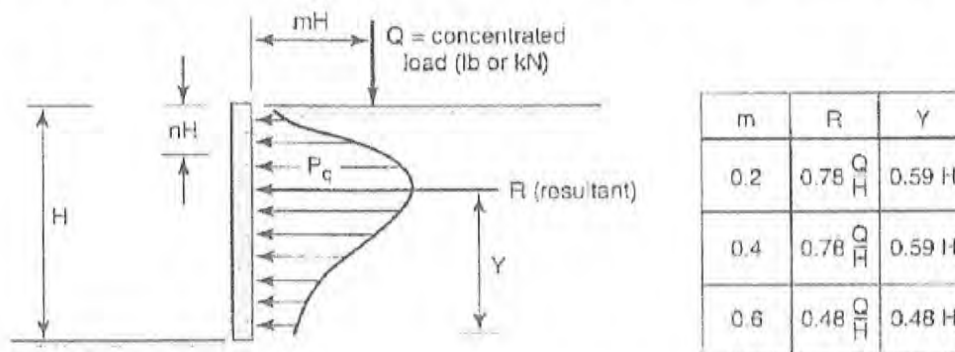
Pressure distribution against vertical wall resulting from point load, Q .
